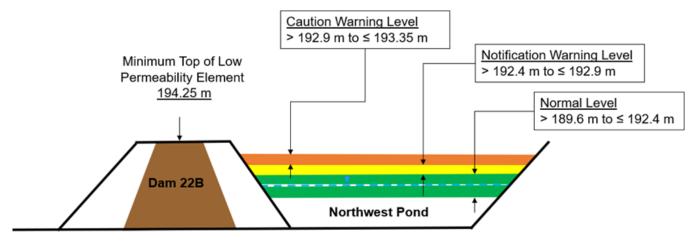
Water and Infrastructure Elevations for Northwest Pond (not to scale)
